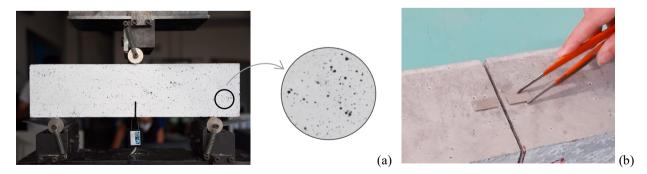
(a) Specimen prepared for three-point bending test (3PBT) and DIC with related detail of speckle pattern; (b) steel plates needed for mounting the clip-on strain gauge on the specimen.
